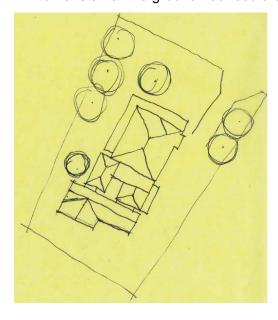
Indicative potential form and roofline of a rear addition, constructed within the identified zone for development
